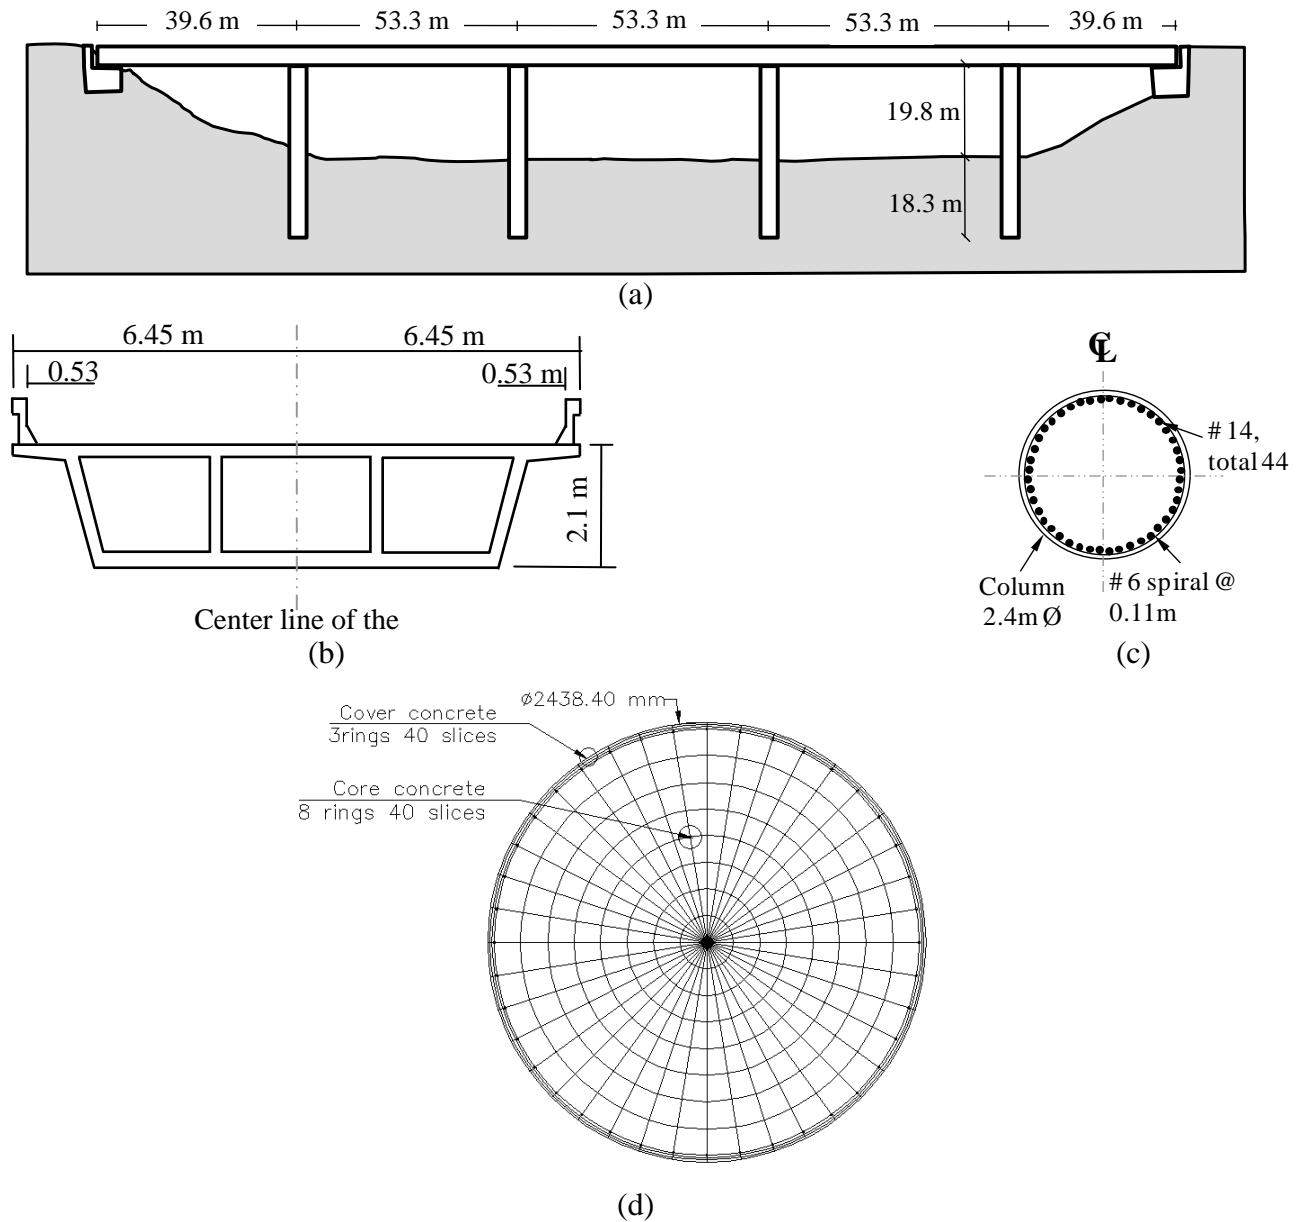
(a) Schematic of the case study bridge, (b) girder cross-section, (c) column cross-section, (d) displacement-based fiber element of column cross-section in OpenSees
